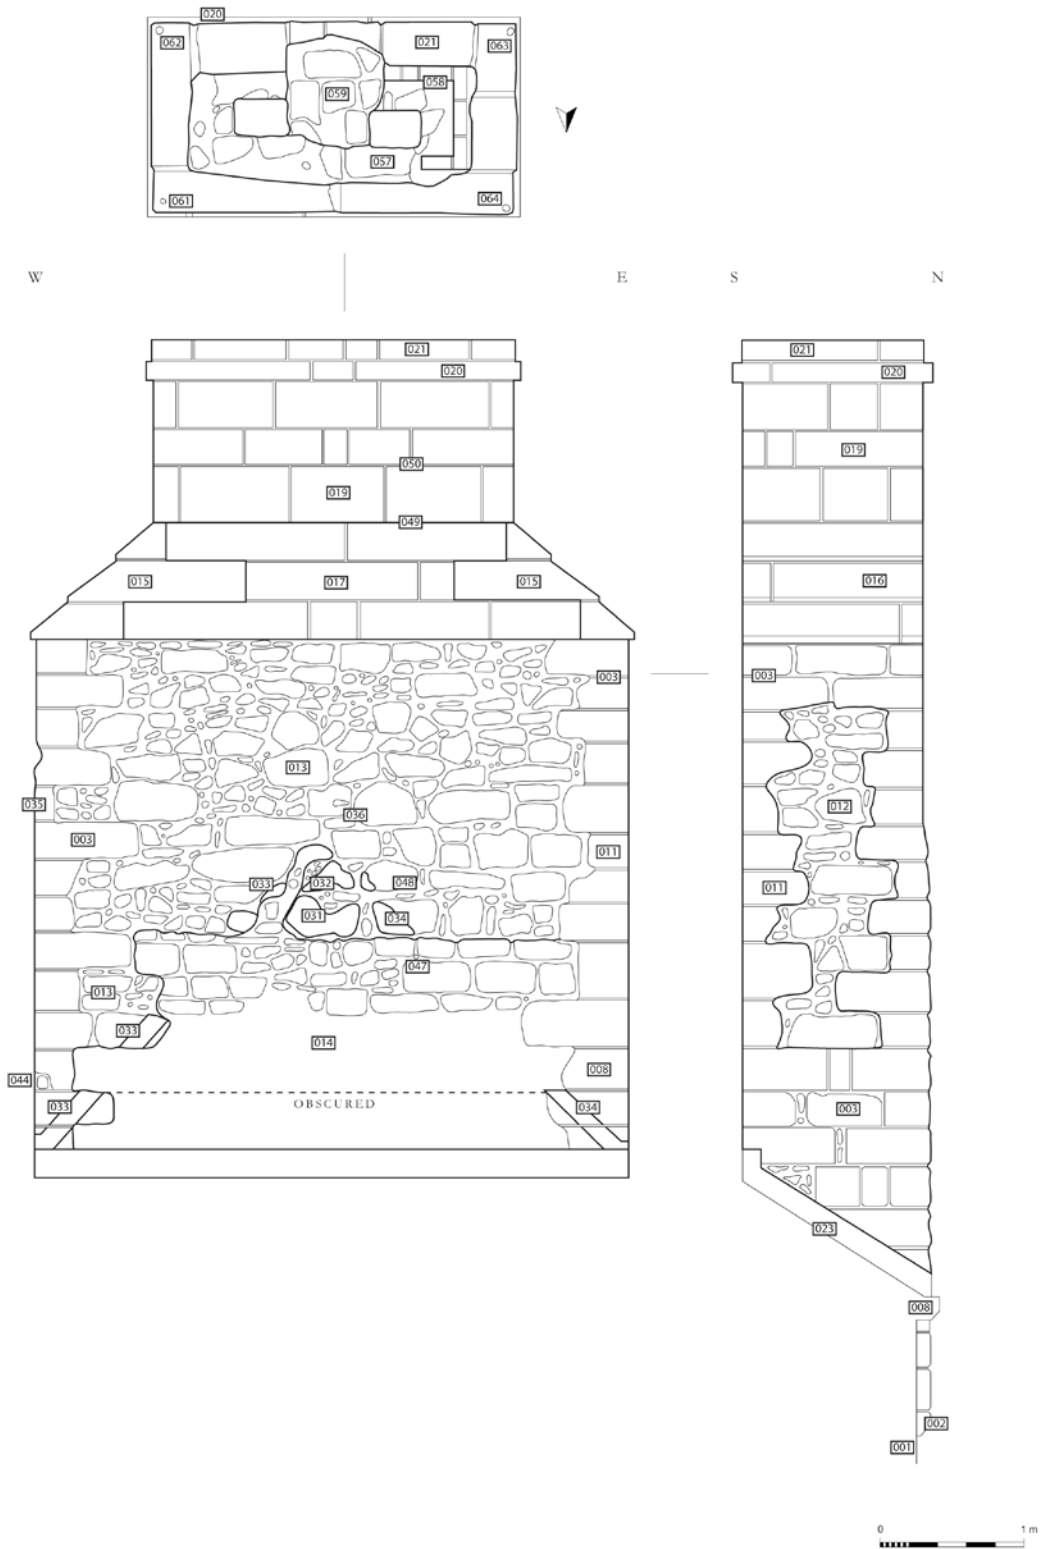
Chimney RC08 plan (top), southern elevation (left), and eastern elevation.
